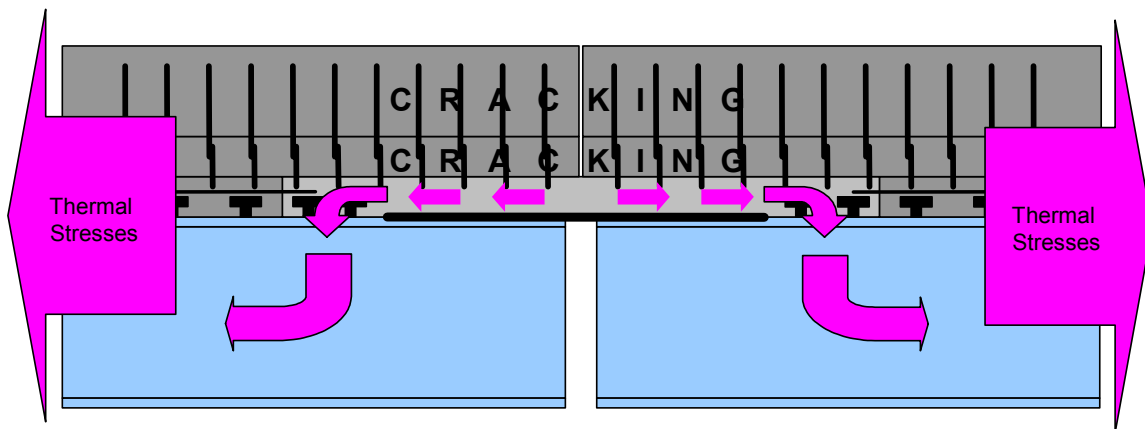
Concrete sidewalk and barrier wall deforming incompatibly with ECC link slab resulting in distributed cracking within the concrete sidewalk and barrier wall.
